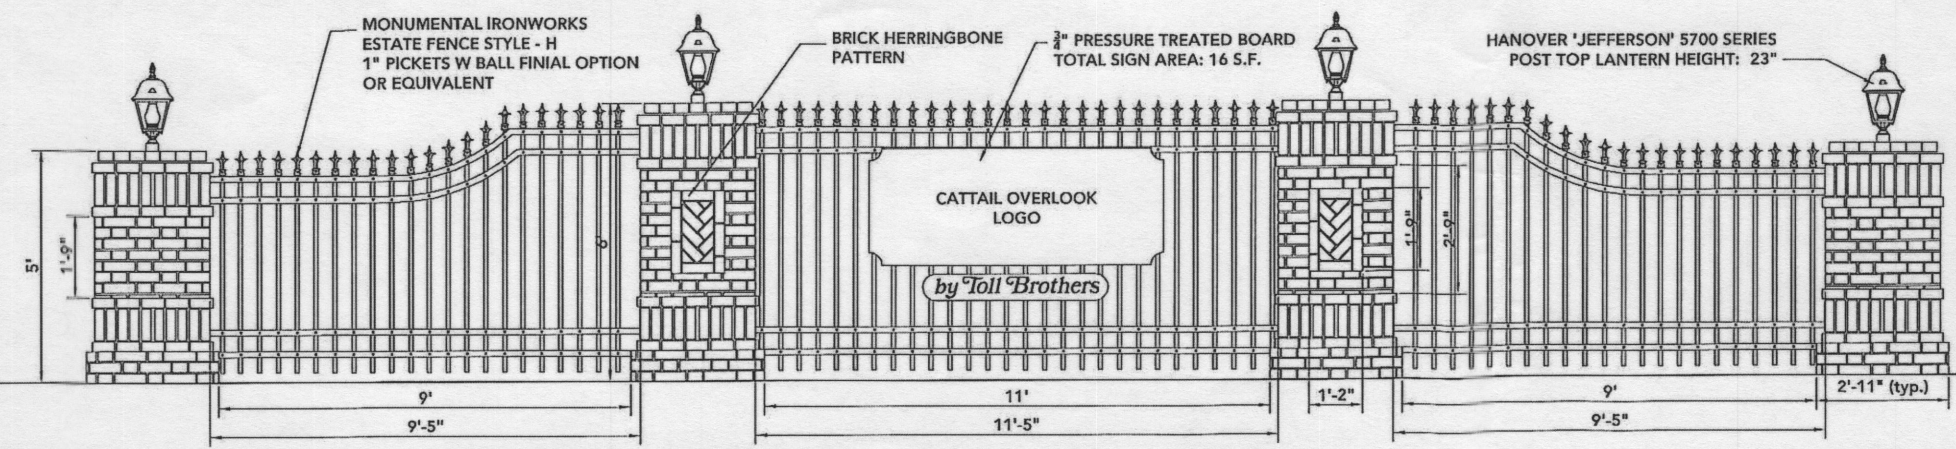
SECONDARY ENTRANCE FEATURE (ELEVATION) SCALE 1/2" = 1'-0"
